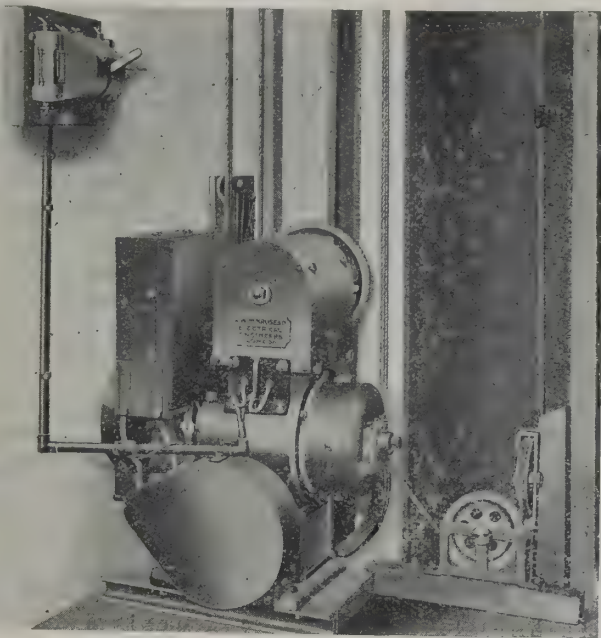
MOTOR AND GEARING FOR GOODS LIFT.
